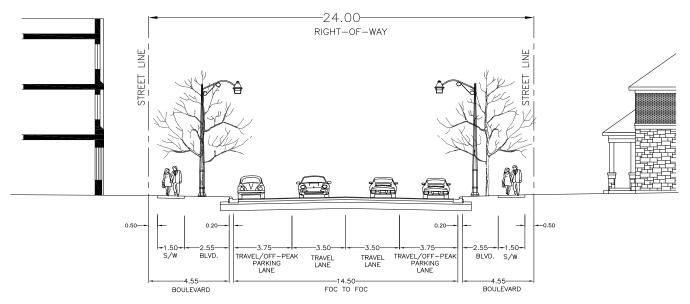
Avenue / Transit Corridor - 24.0m R.O.W. / 4 travel lanes / off-peak on-street parking on both sides / 4.5m boulevard
